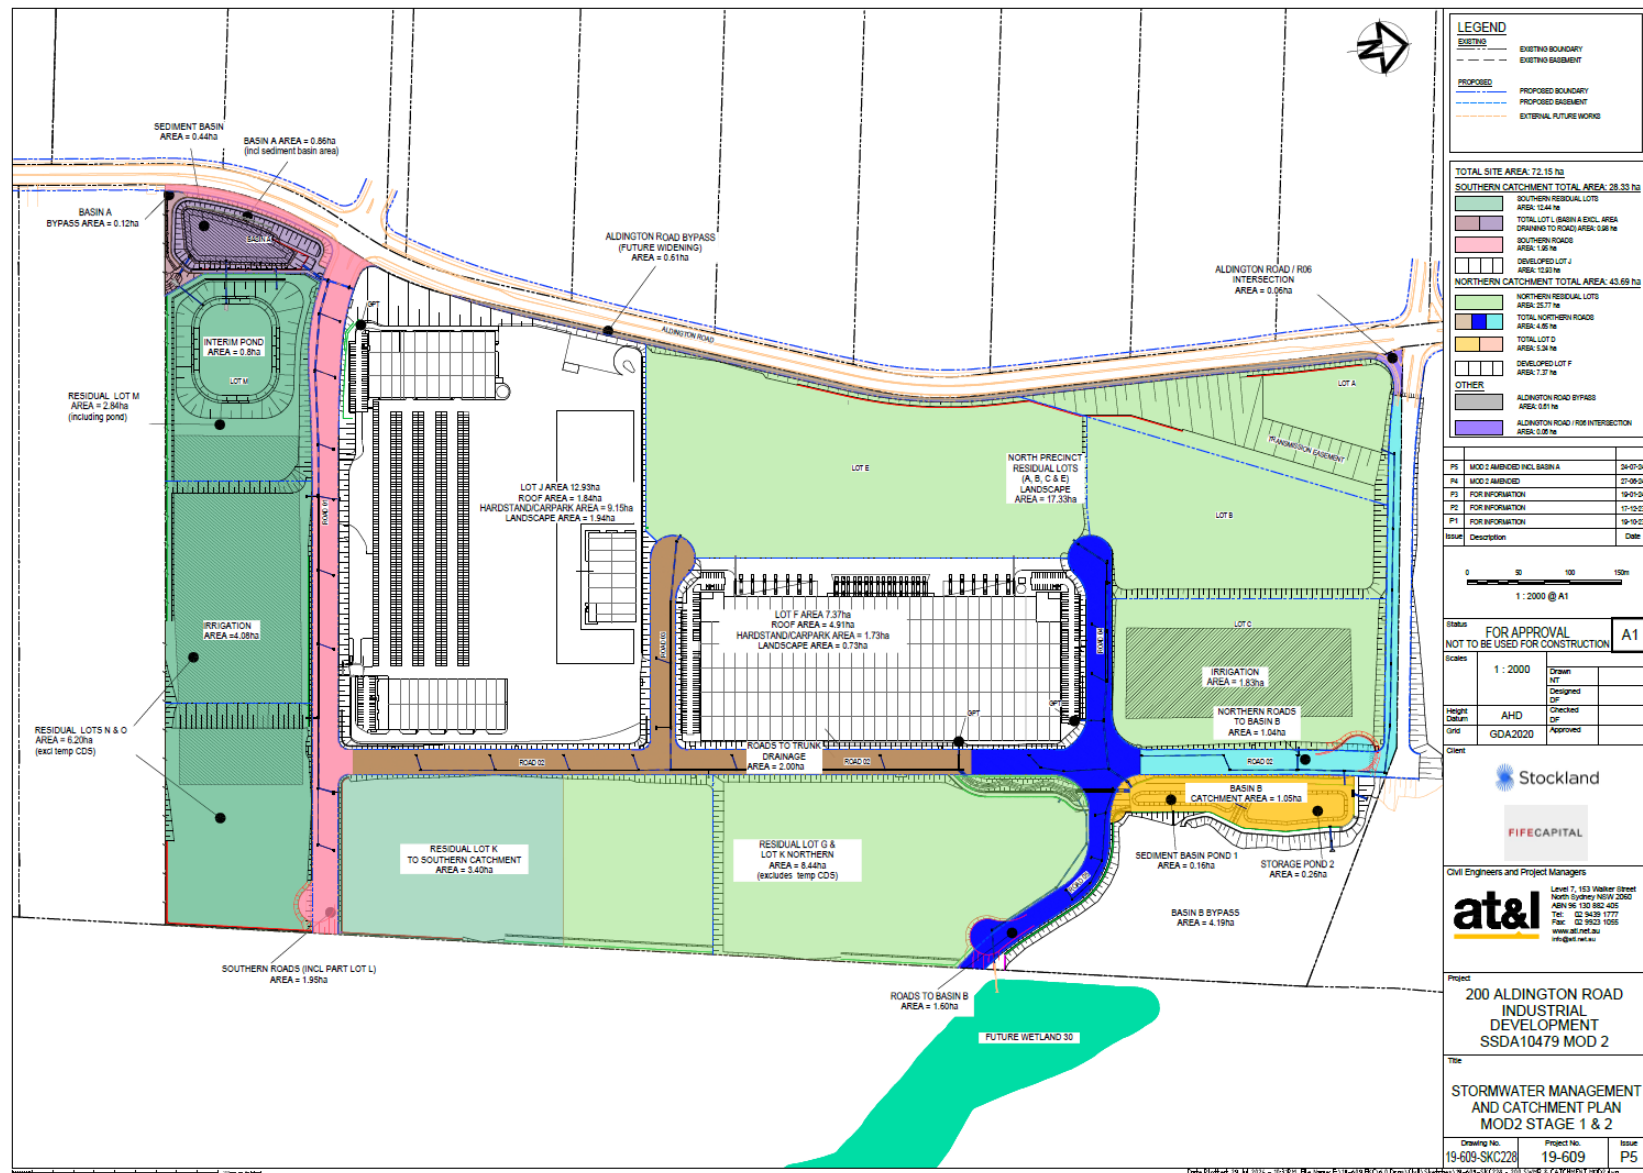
Stage 1 – Internal Roads, Intersections, Basins and Lot F
